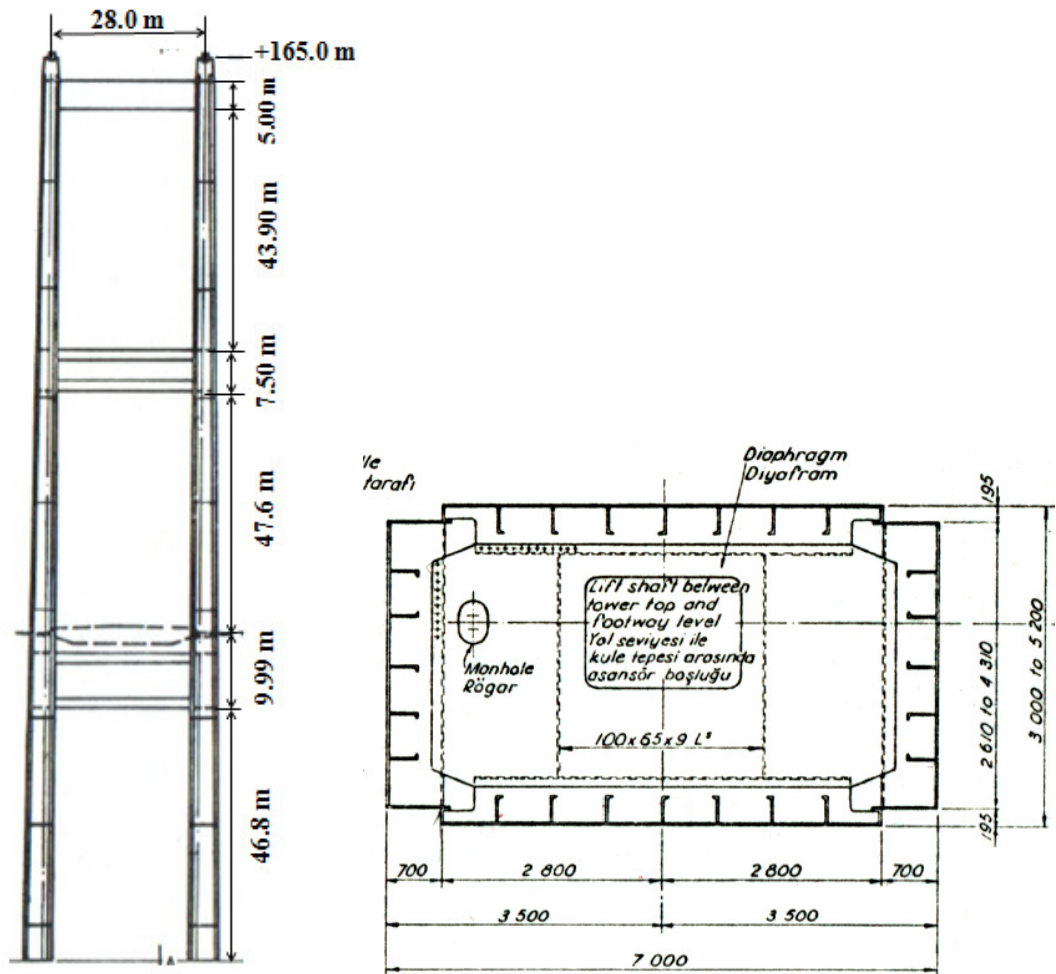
Bridge tower layout and bridge tower leg cross section at the base
